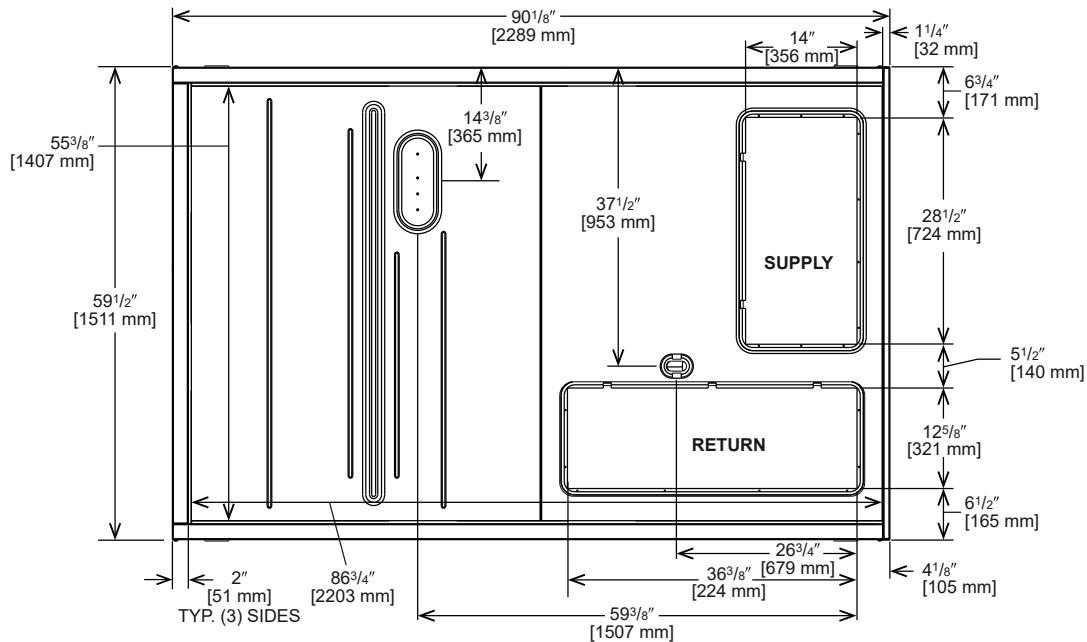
MPS 007D – 012D Horizontal Duct Dimensions Curb Dimensions
